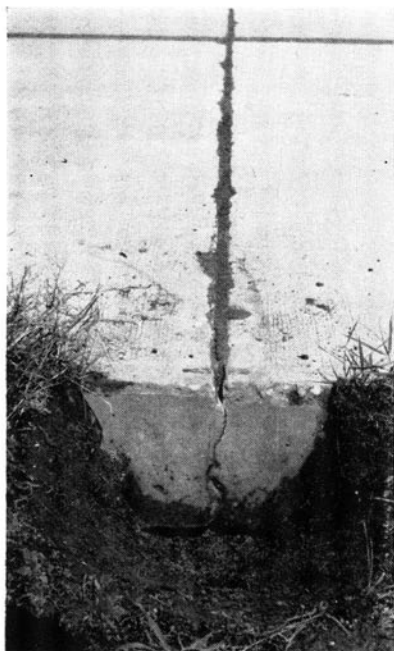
DUMMY CONTRACTION JOINT AT STA. 98 + 40, SHOWING TYPICAL CRACK FORMED BY 1-IN. GROOVE (JULY 23, 1941)
